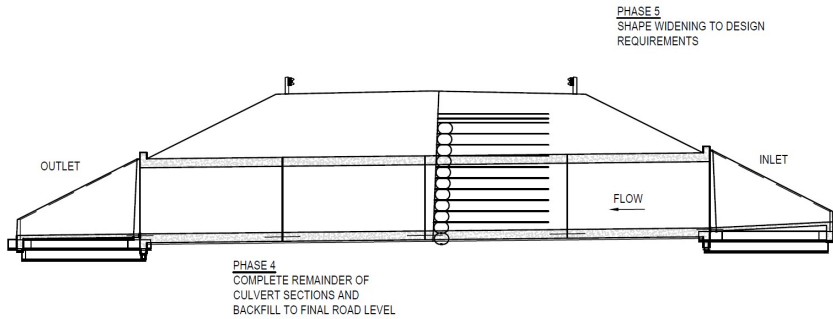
Construction Stage 2: Left hand side constructed to final road level
